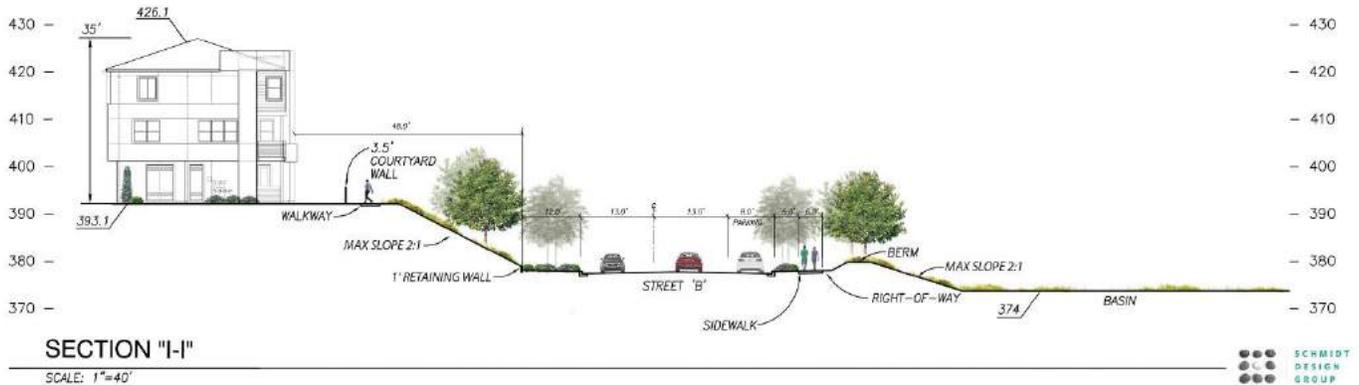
Internal Condition @ R-2 / Street “B” (Cross Section I-I)
